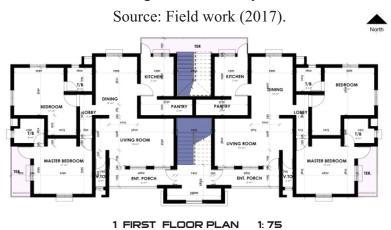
(Type 3): Typical first floor plan of two families' semidetached storey housing unit in the study area.
